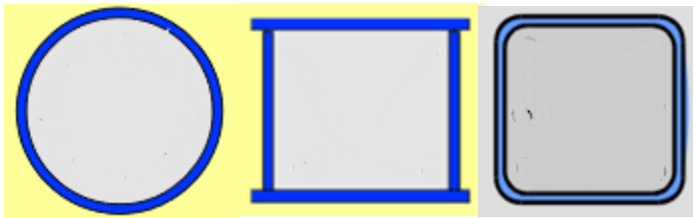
Steel sections filled with concrete only. Source: G. Hansville: Eurocode 4 composite columns. [14].
